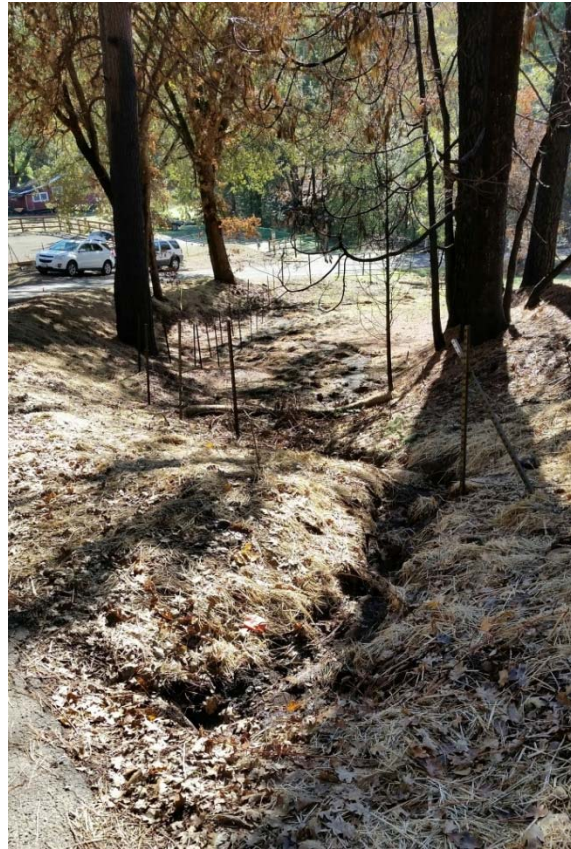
(post-fire). View of erosional feature south and west of Whiskey Slide Road from culvert outlet at Whiskey Slide Road. Photo date: 11/11/2015
